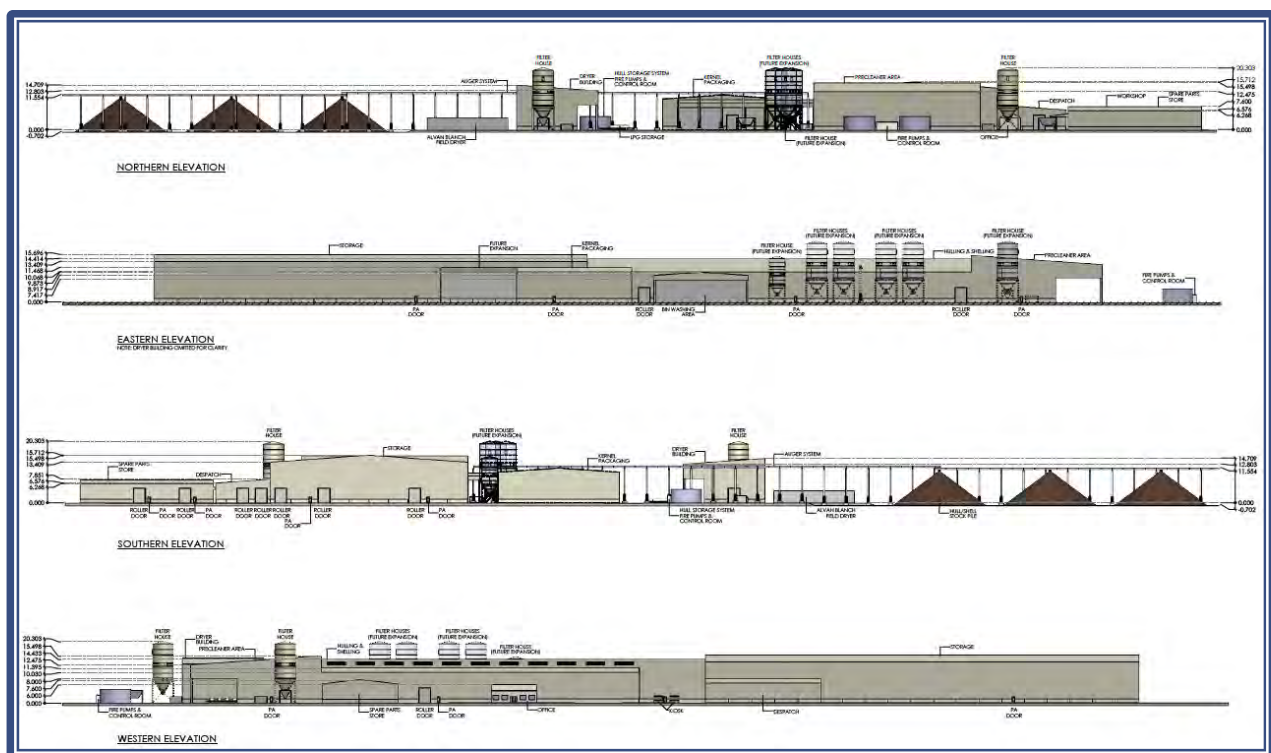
Cross sections of proposed facility (Source: JMA Plans – Sheet A300)
